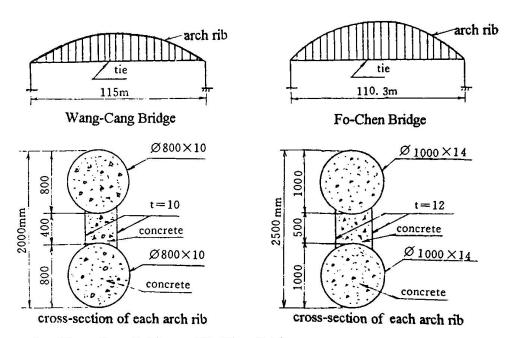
Wang-Cang Bridge and Fo-Chen Bridge
